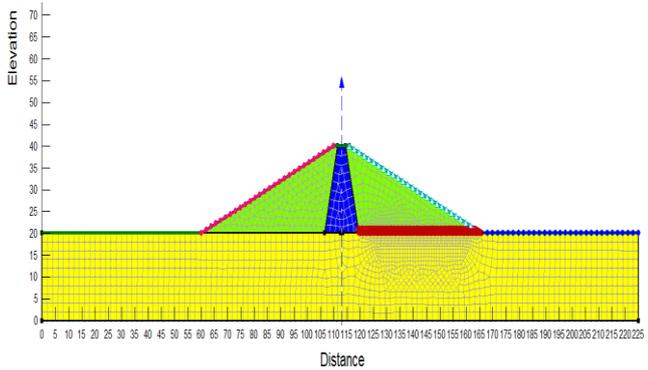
Cross section of earth dam with horizontal drain length of 46.5 meters from toe of the dam
